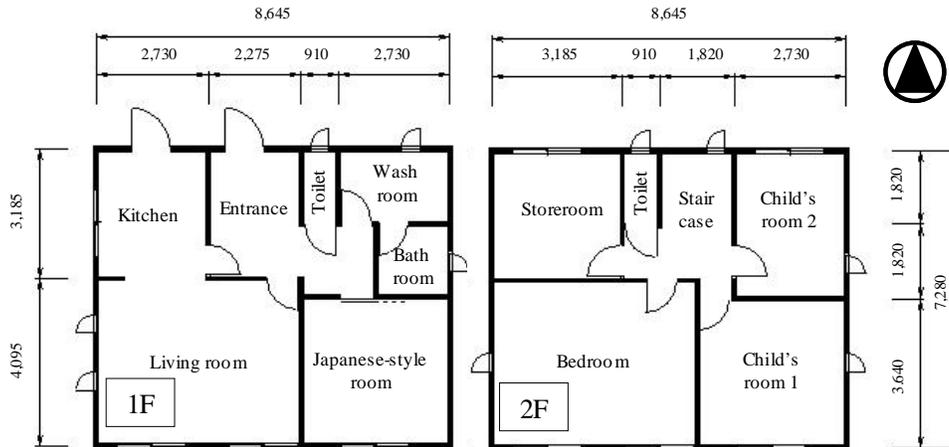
Floor plan of a standard residential house model proposed by the Architectural Institute of Japan
